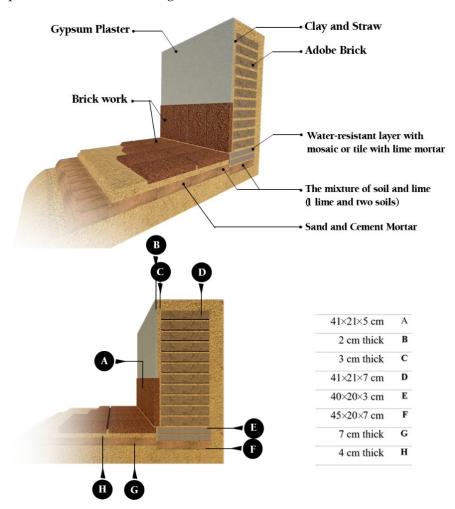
Example of architectural detail for conservation walls meeting the ground level.
